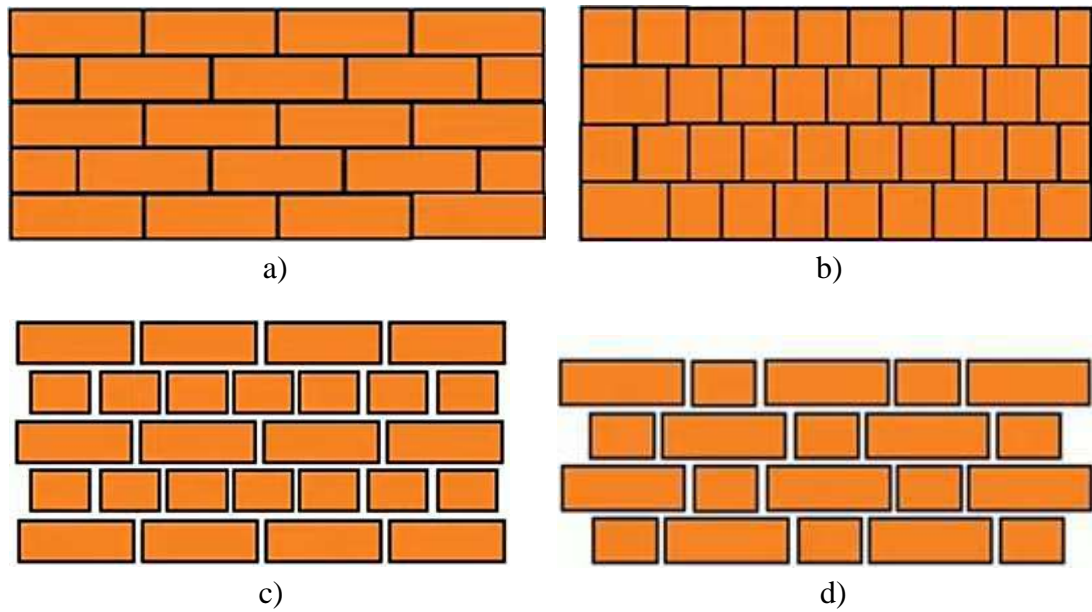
Typical bonds in masonry walls, a) Stretcher bond, b) Header bond, c) English bond, d) Flemish bond
